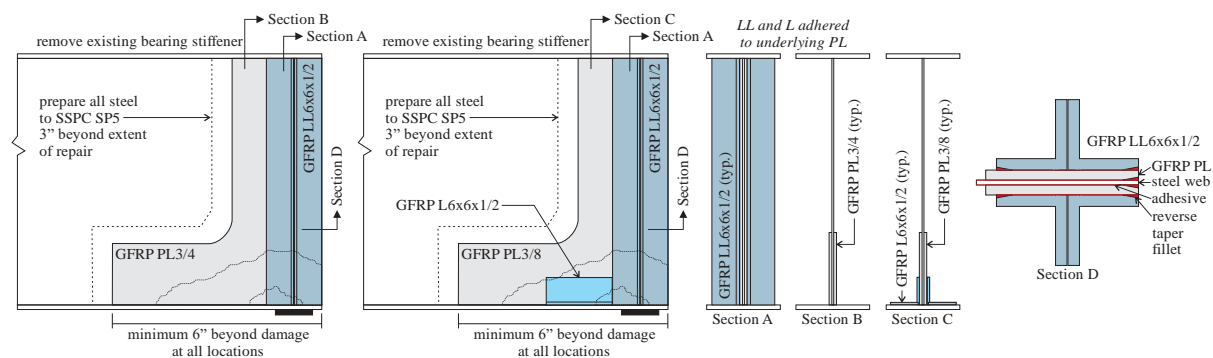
Conceptual representation of adhesive-bonded FRP repairs for plate girder
